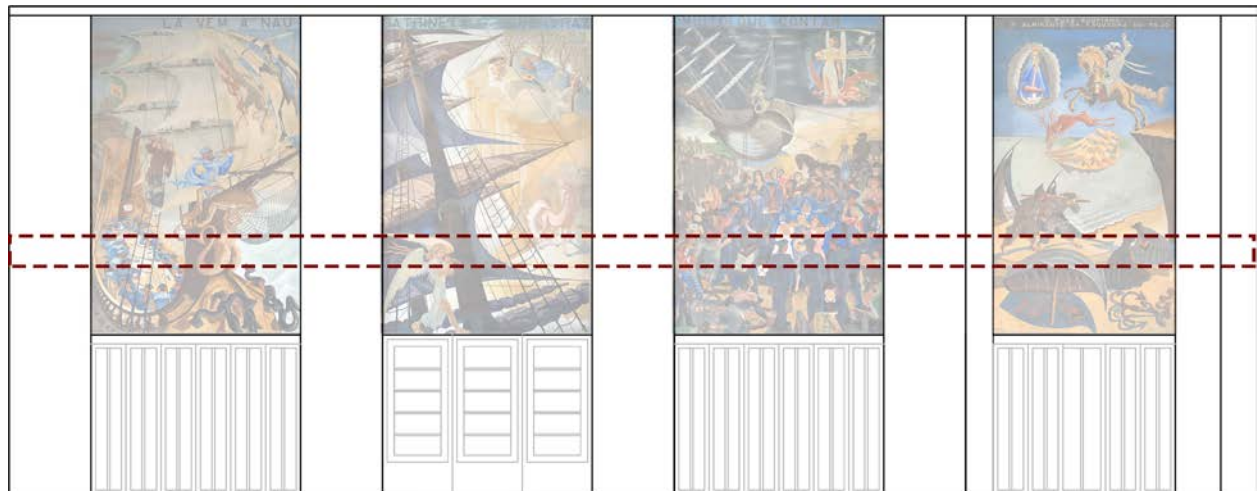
Scheme of the west wall of Alcântara station with display of the murals and indicated position of thermal bridge that corresponds with construction joint between two floors. Drawing by the author
